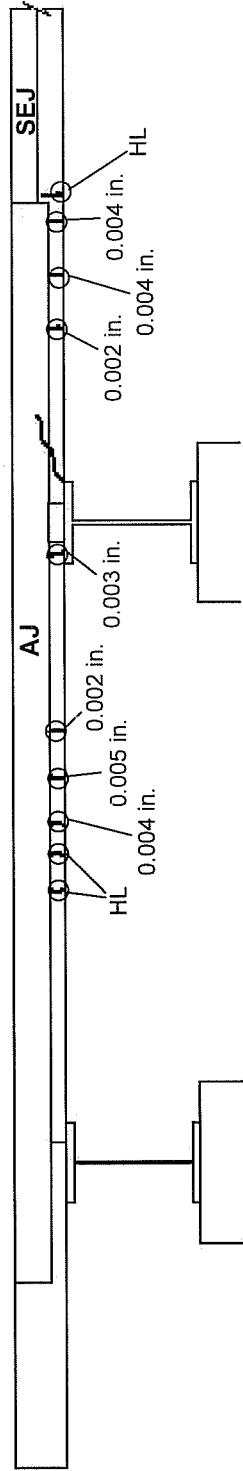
Crack map, AJ, 6 in. top reinforcement spacing, negative-moment, side view of slab, 4.8 x HS-25
